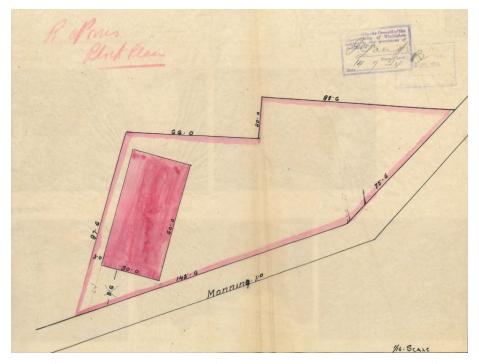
Site plan showing the original parcel of land bought by Norris with the proposed location of the garage. (Source: BA352/24)
